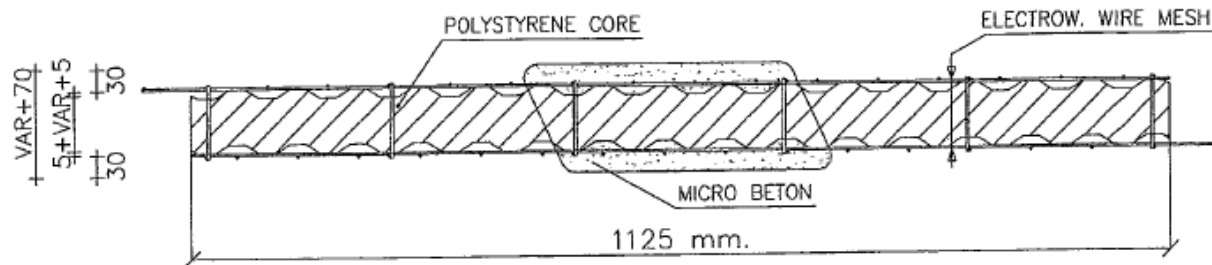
Emmedue Single Panel PSM80 Details (Ref. 1, p.7)
